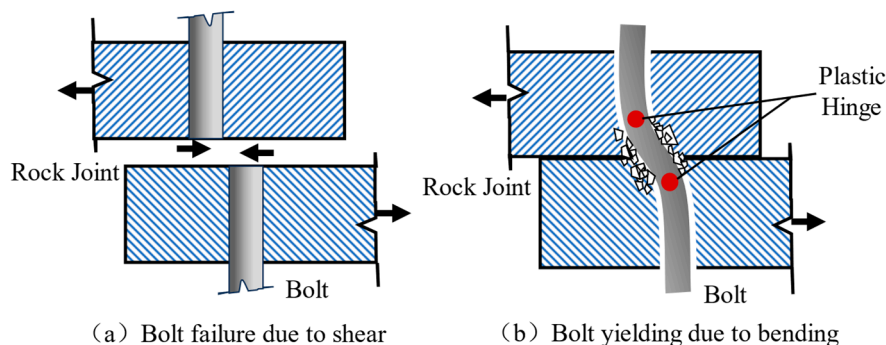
Failure modes of bolts at rock joints: (a) shear failure, where the bolt is fractured across the rock joints; (b) bending yield, where a plastic hinge is formed in the bolt due to bending deformation.
